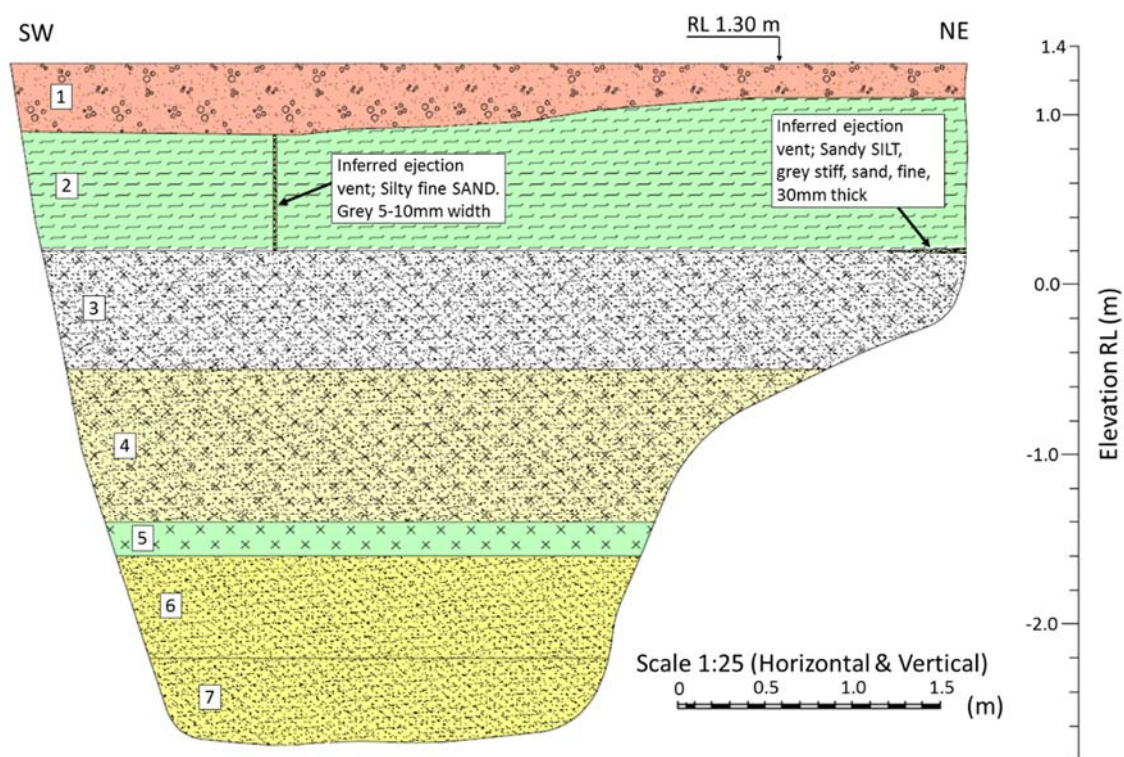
Cross-section of excavation trench at the 4-NS-1 Test Panel. Modified from van Ballegooy et al. 2017.
